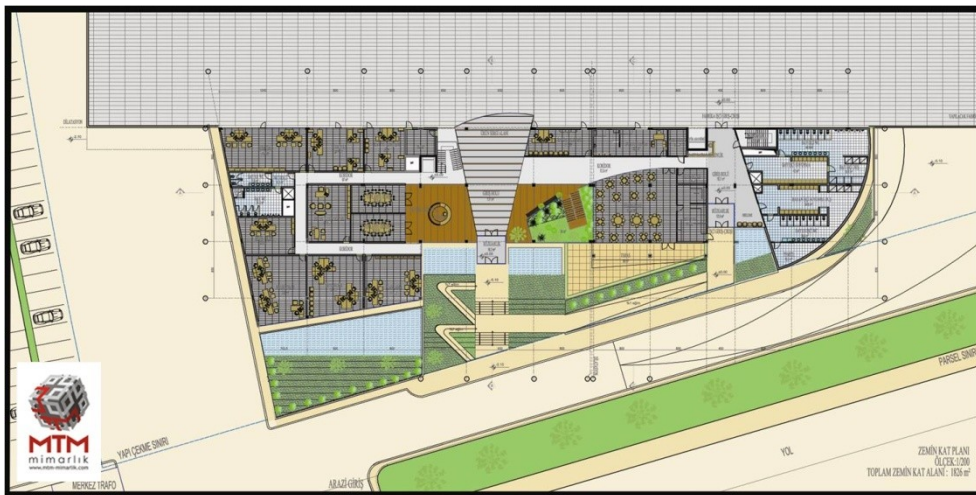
Office blocks, ground floor plan (Design after BREEAM)
